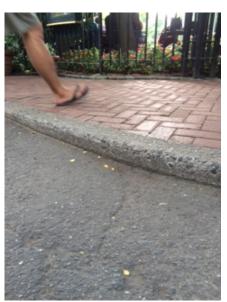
Photograph of Curb Outside Restaurant; visible is the step up from the street to the brick entrance level and poured asphalt ramp. Taken August 27, 2015.
